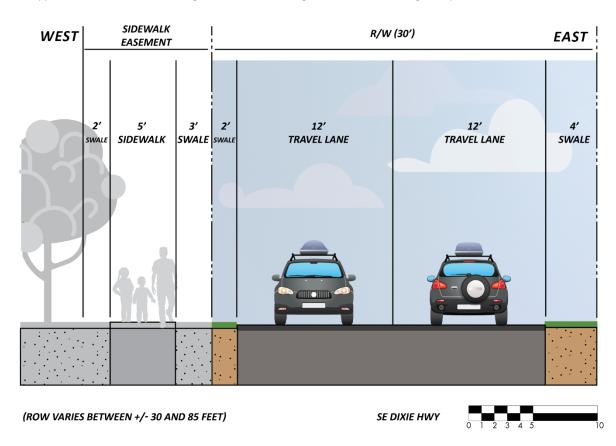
Existing Rural Typical Section for CR-A1A/Dixie Hwy
